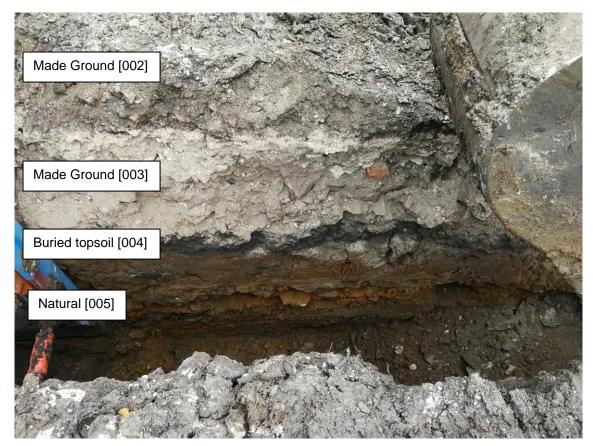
View of section of pipe trench with topsoil removed showing layers of made ground over remnant buried topsoil and natural
